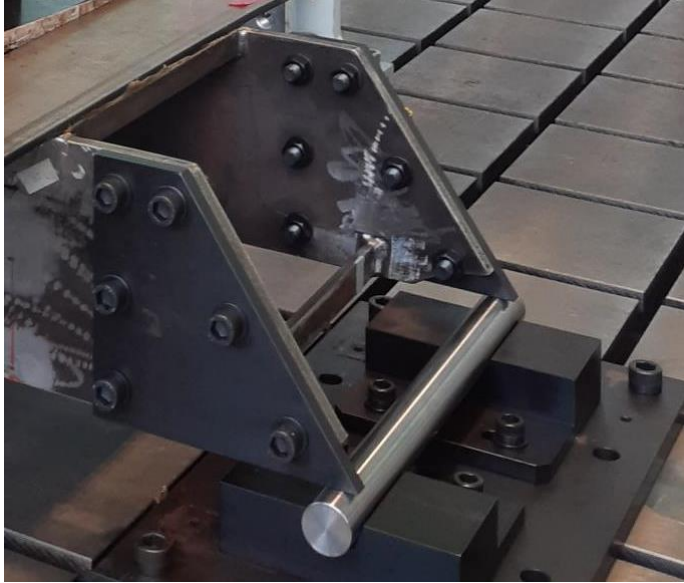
Welded joint a reinforcement bar and a main plate.
